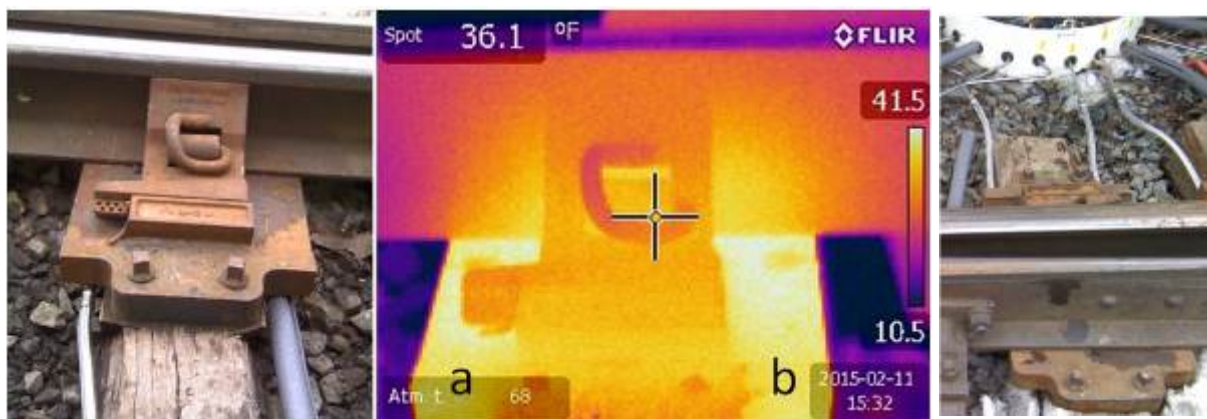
(left) Switch Plate 3N (middle) Infrared Image of Switch Plate 3N (right) Photo of Tubing from Switch Plate 3N to Well
